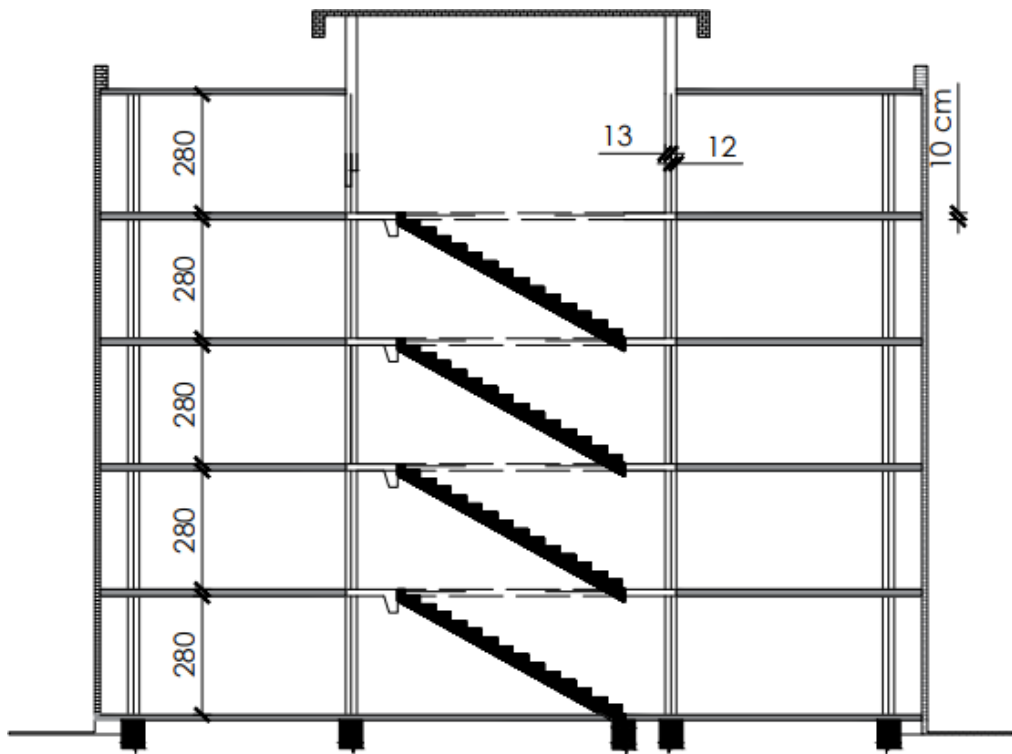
Elevation Profile of the 5-story RC Building (dimensions are given in cm)
